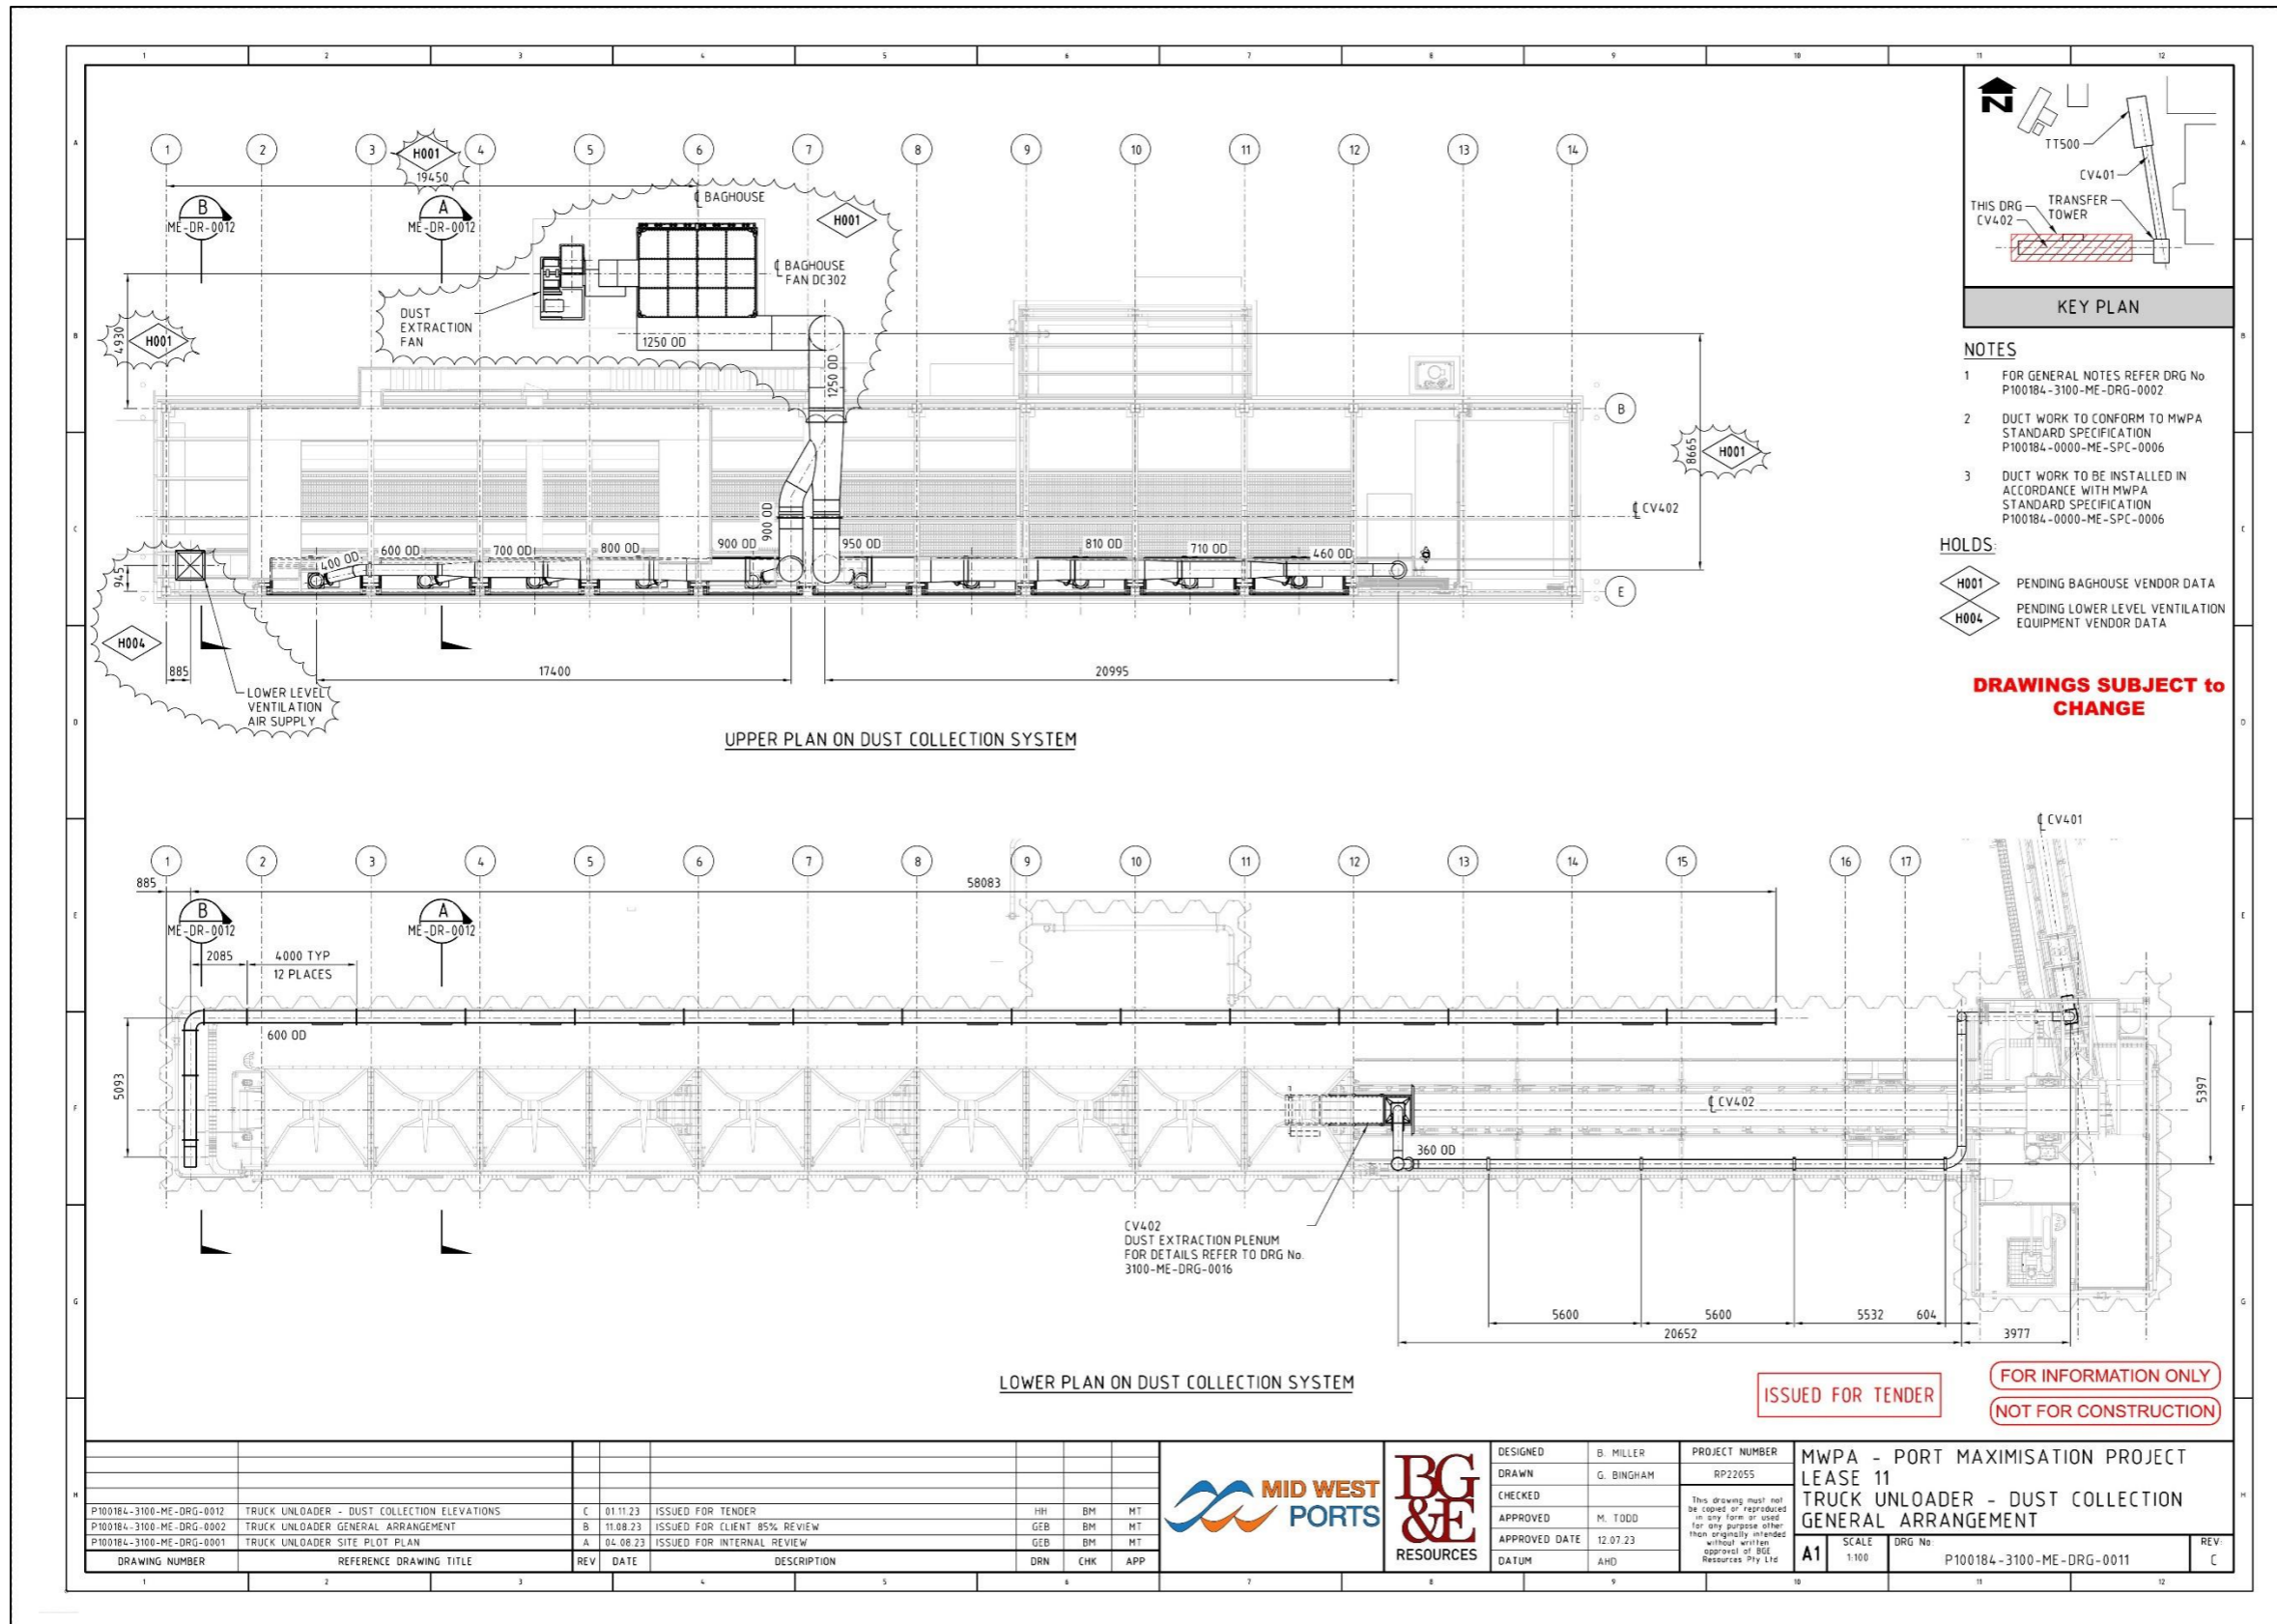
Construction drawing for baghouse dust extraction system – general arrangement
